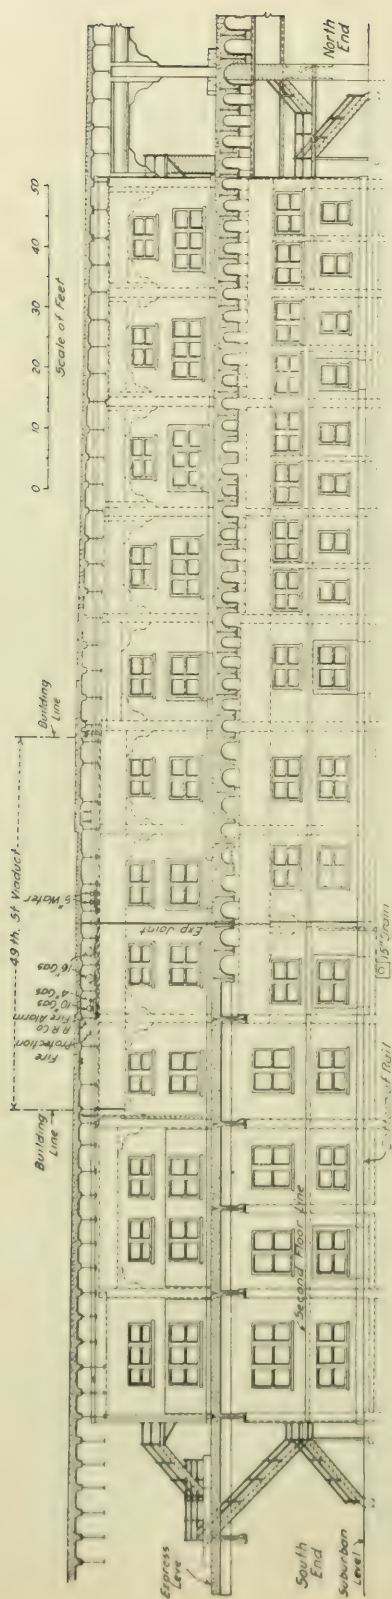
East Elevation of Signal Stations A and B; Grand Central Terminal.
